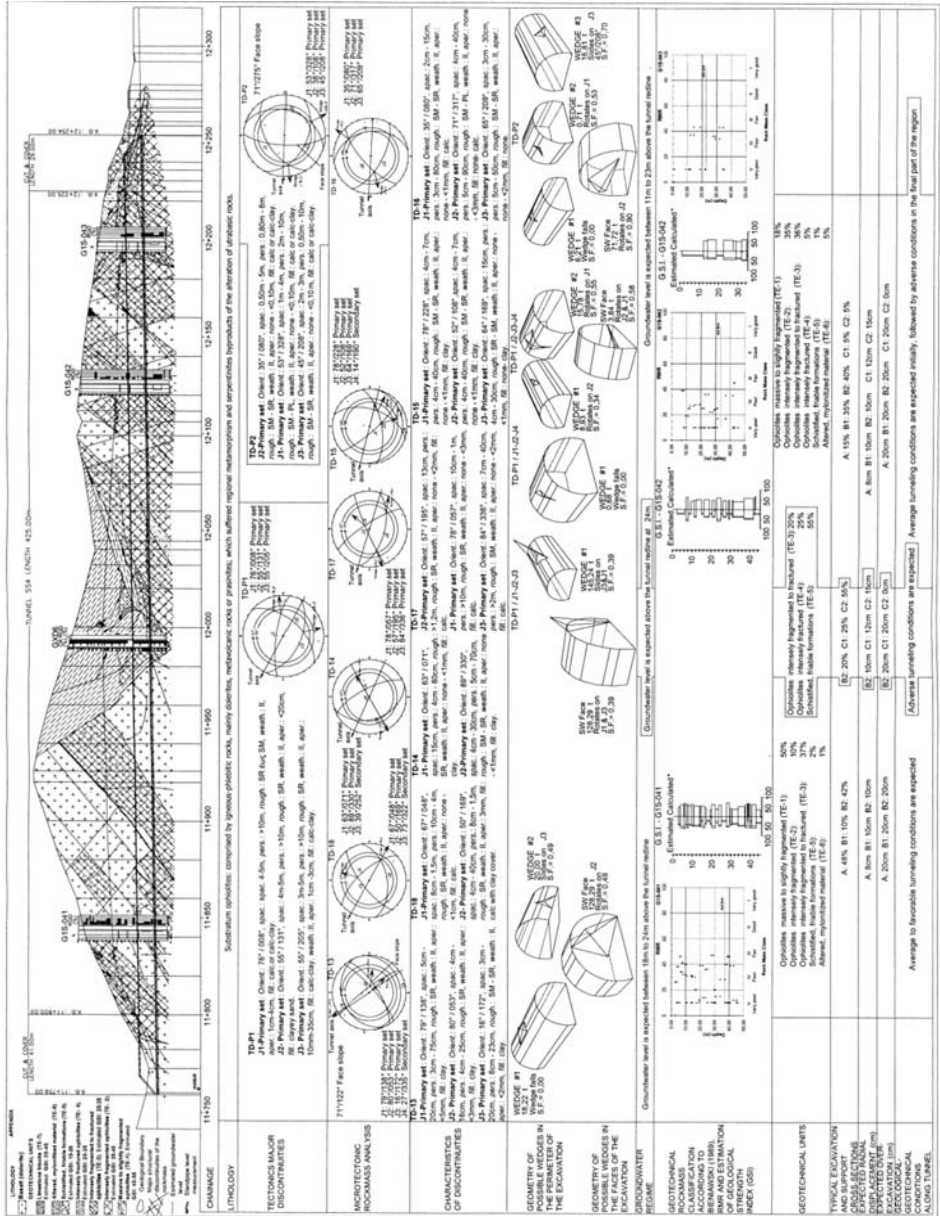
Geotechnical longitudinal section of SS4 tunnel
